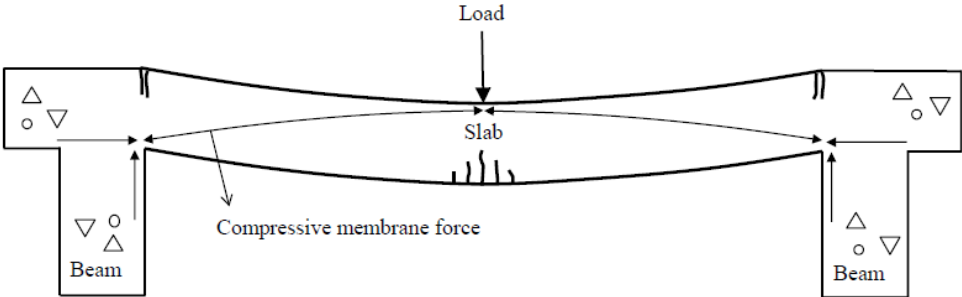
CMA in a reinforced concrete bridge deck slab. (Hon, Taplin, & Al-Mahaidi, 2005)
